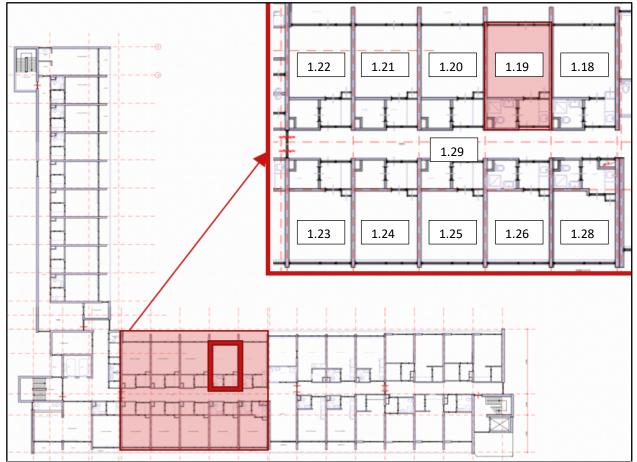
Floorplan first floor of the Schuylenburcht complex, room of fire origin is highlighted [20]
